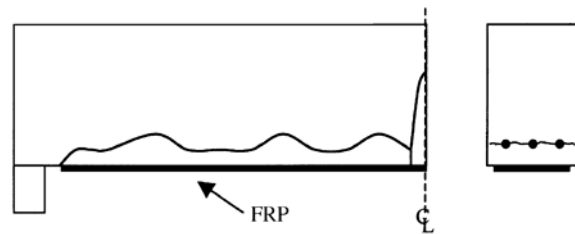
Delamination Caused by Tension Failure of the Concrete Cover
